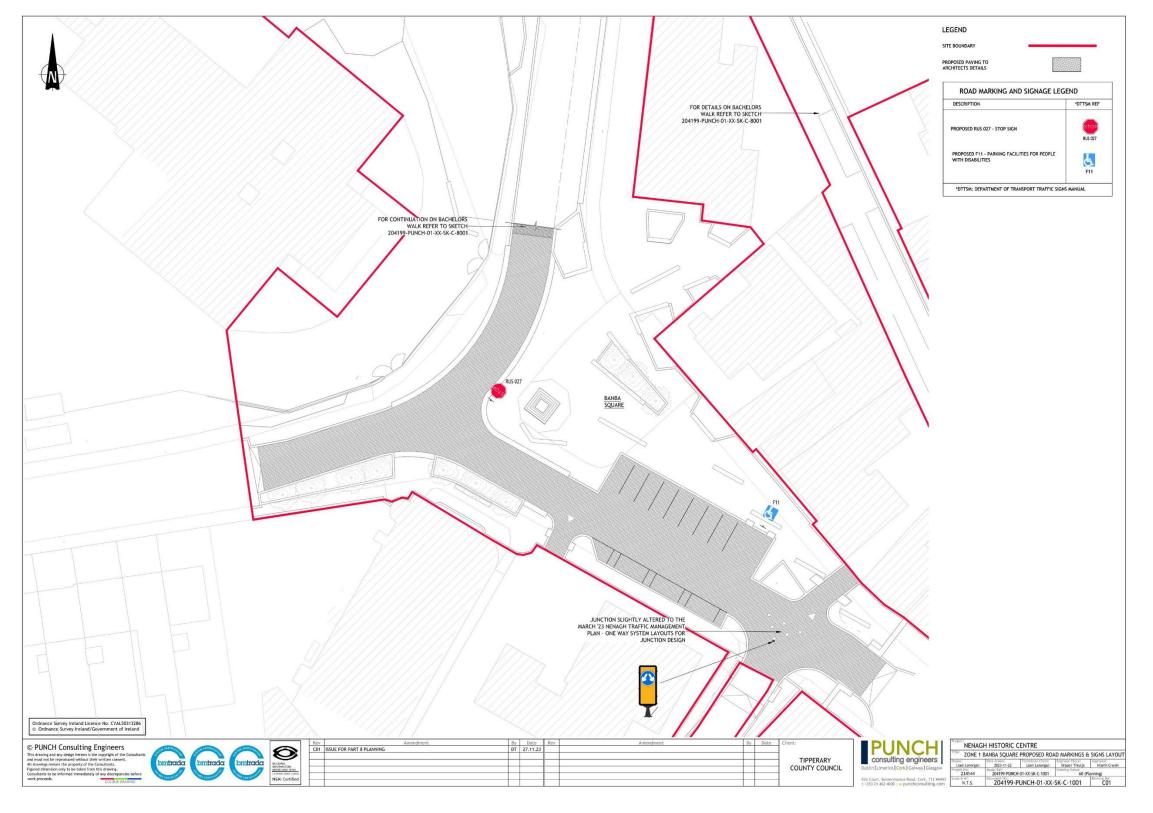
Proposed Road Design Banba Square (NHCQ Zone 1)
